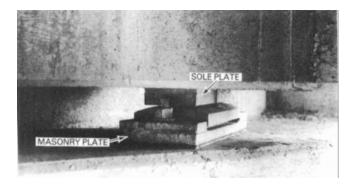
Metal bearings. (Sheet 2 of 4)
